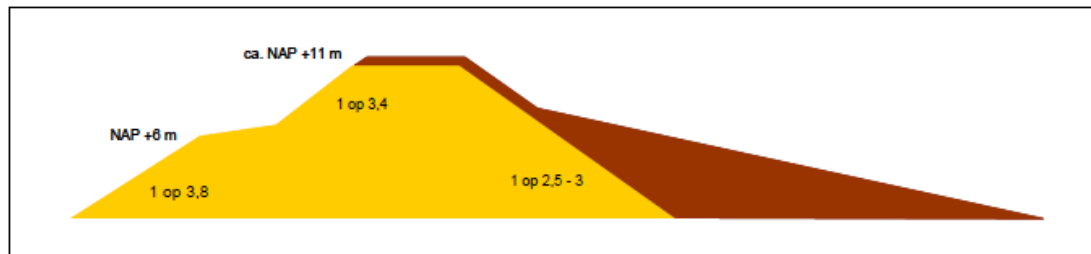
Schematic drawing of a Delta Dyke along the Western Scheldt
